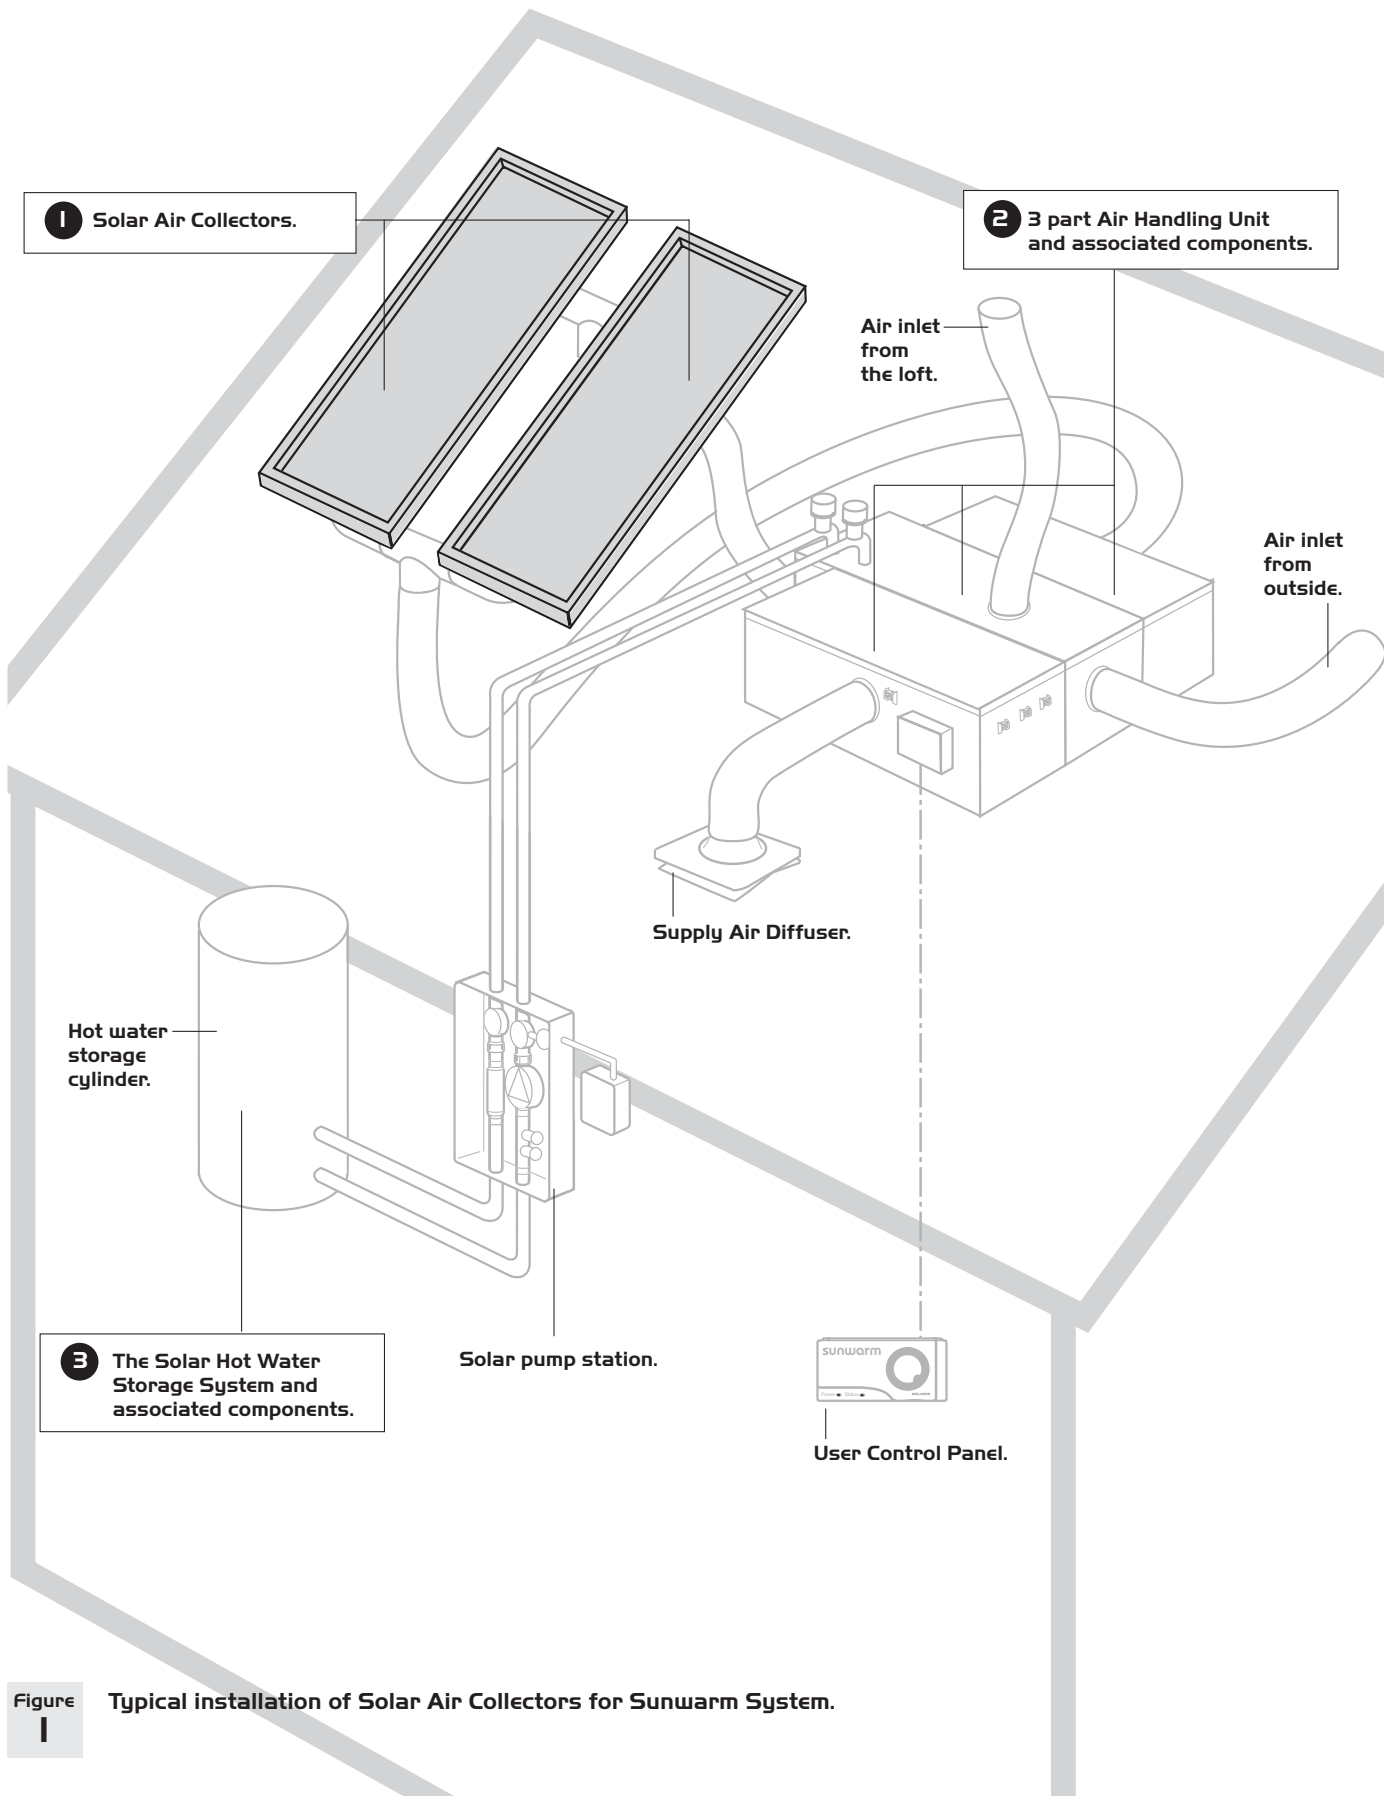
Typical installation of Solar Air Collectors for Sunwarm System.
